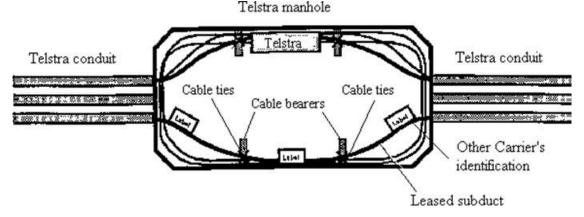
Labelling Subduct in a Telstra InfraCo Manhole
